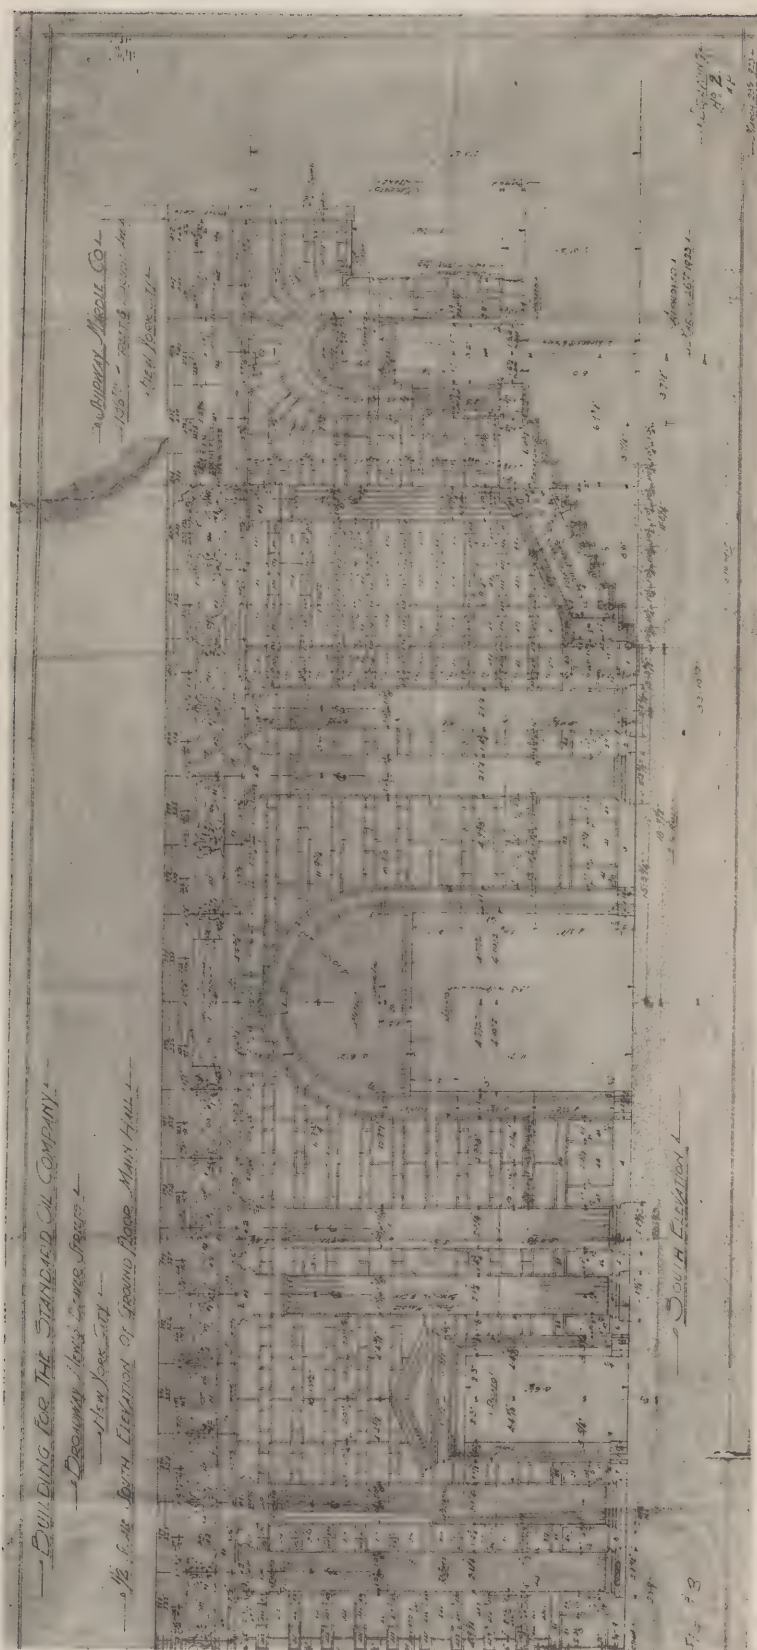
South Elevation, Ground Floor, Main Hall. Building for The Standard Oil Company, New York City.
